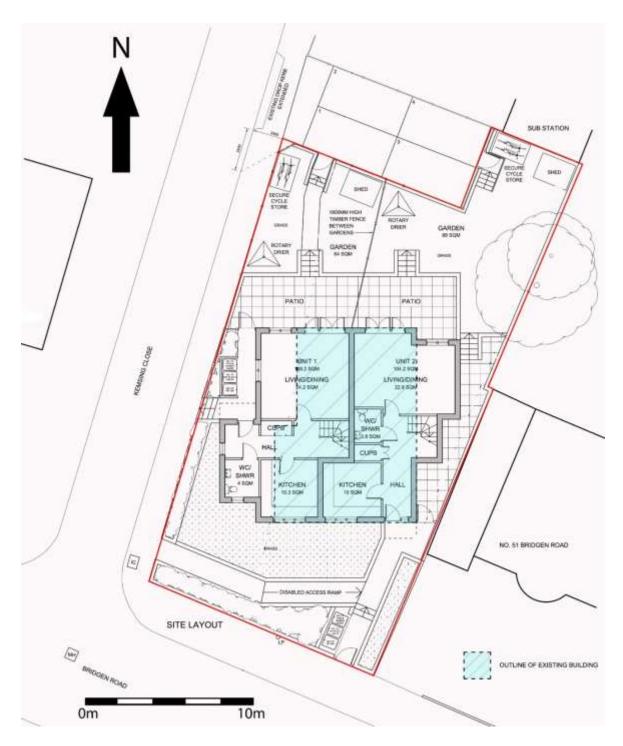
Site plan showing the proposed development, along with the existing 1960s building in green
